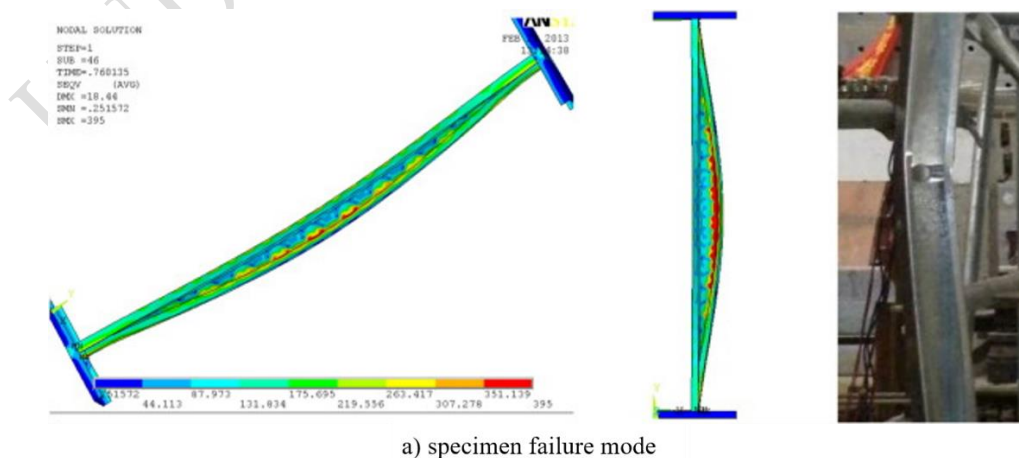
Seismic test of cold-formed thin-walled steel wall
